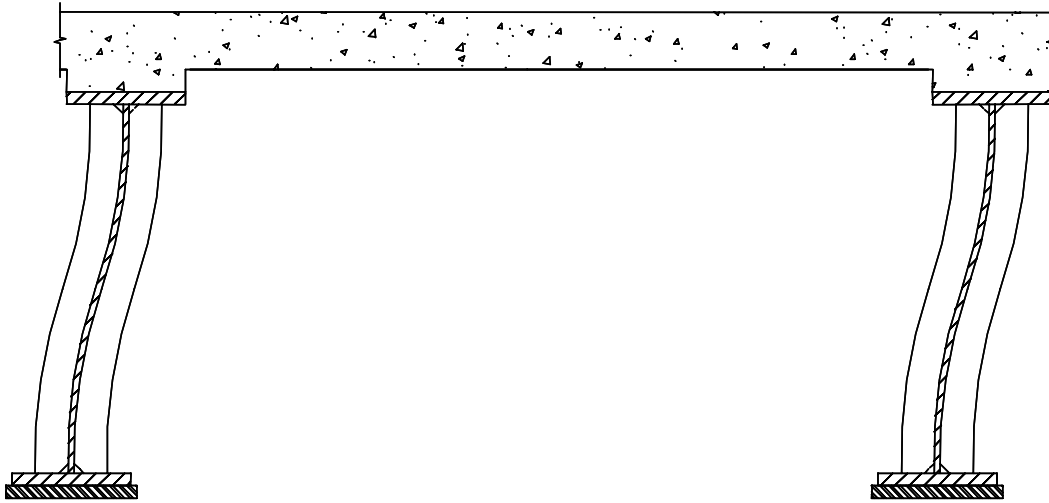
Deformed end region of two girder bridge with trimmed bearing stiffeners
